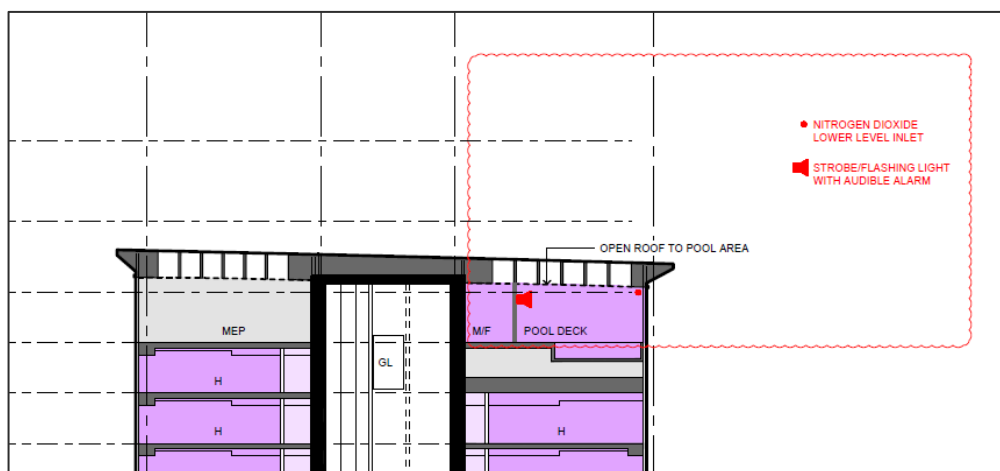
| Section showing proposed open roof area above the level 22 and 23 pool and bar area and location of NO₂ monitors and alarm (Source: Applicant's Architectural drawings).
